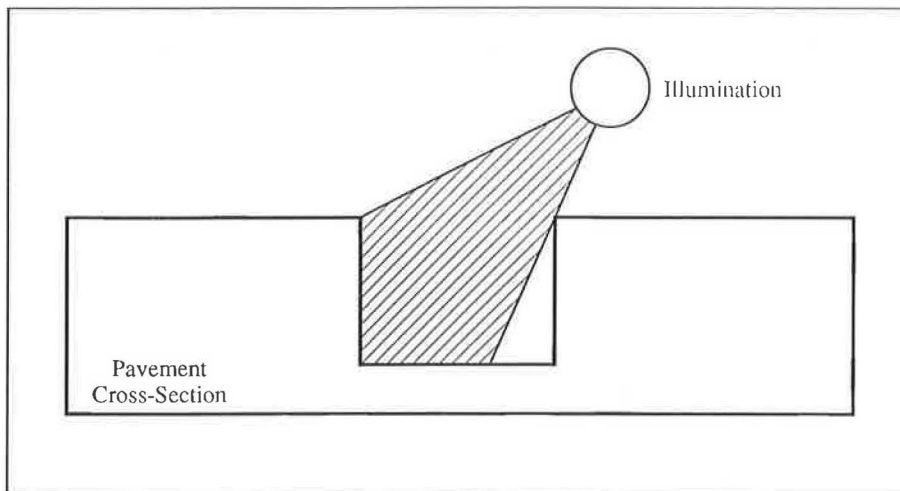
Cross-sectional view of an idealized pavement crack.
